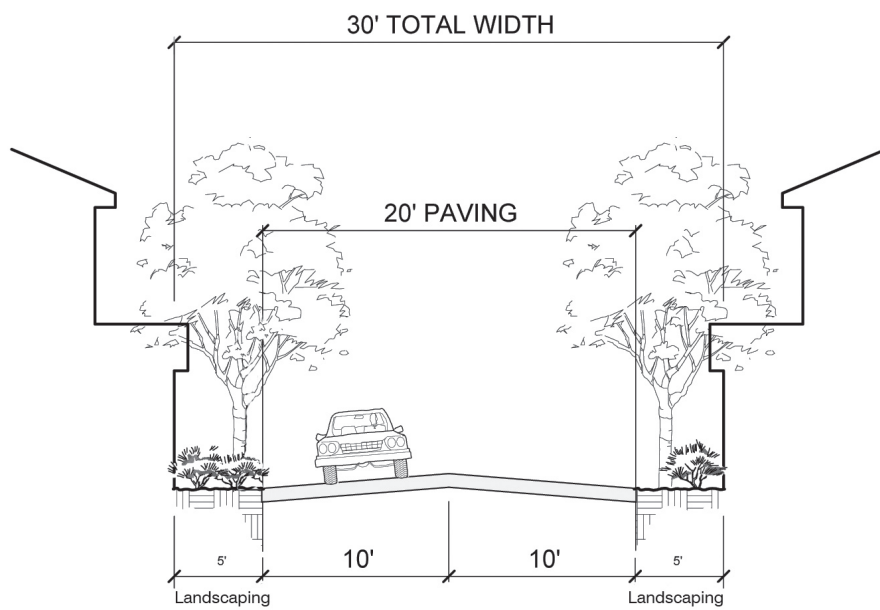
Conceptual Lane (Private Alley) Master Plan
